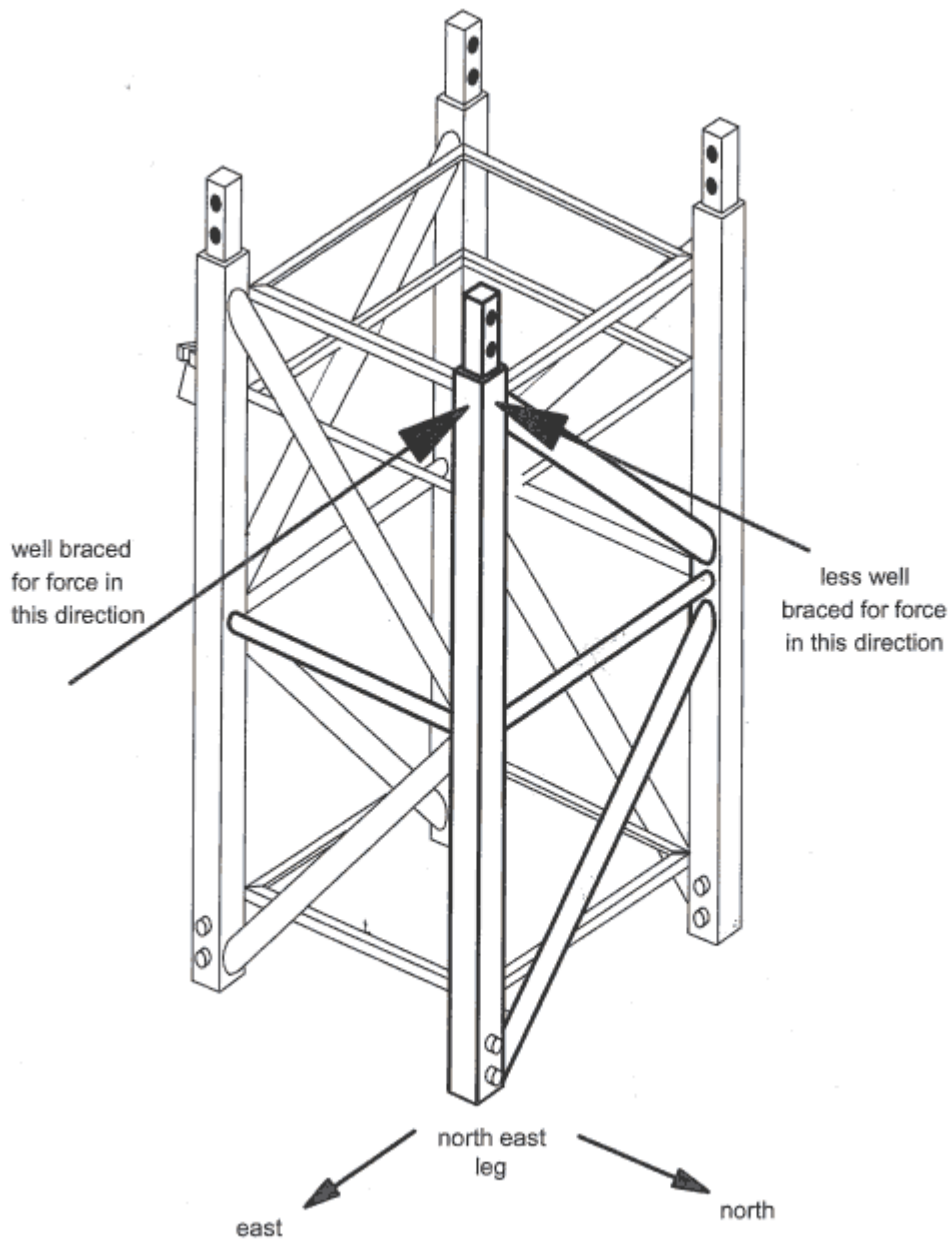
Drawing of top mast section illustrating the reason for the pattern of damage
